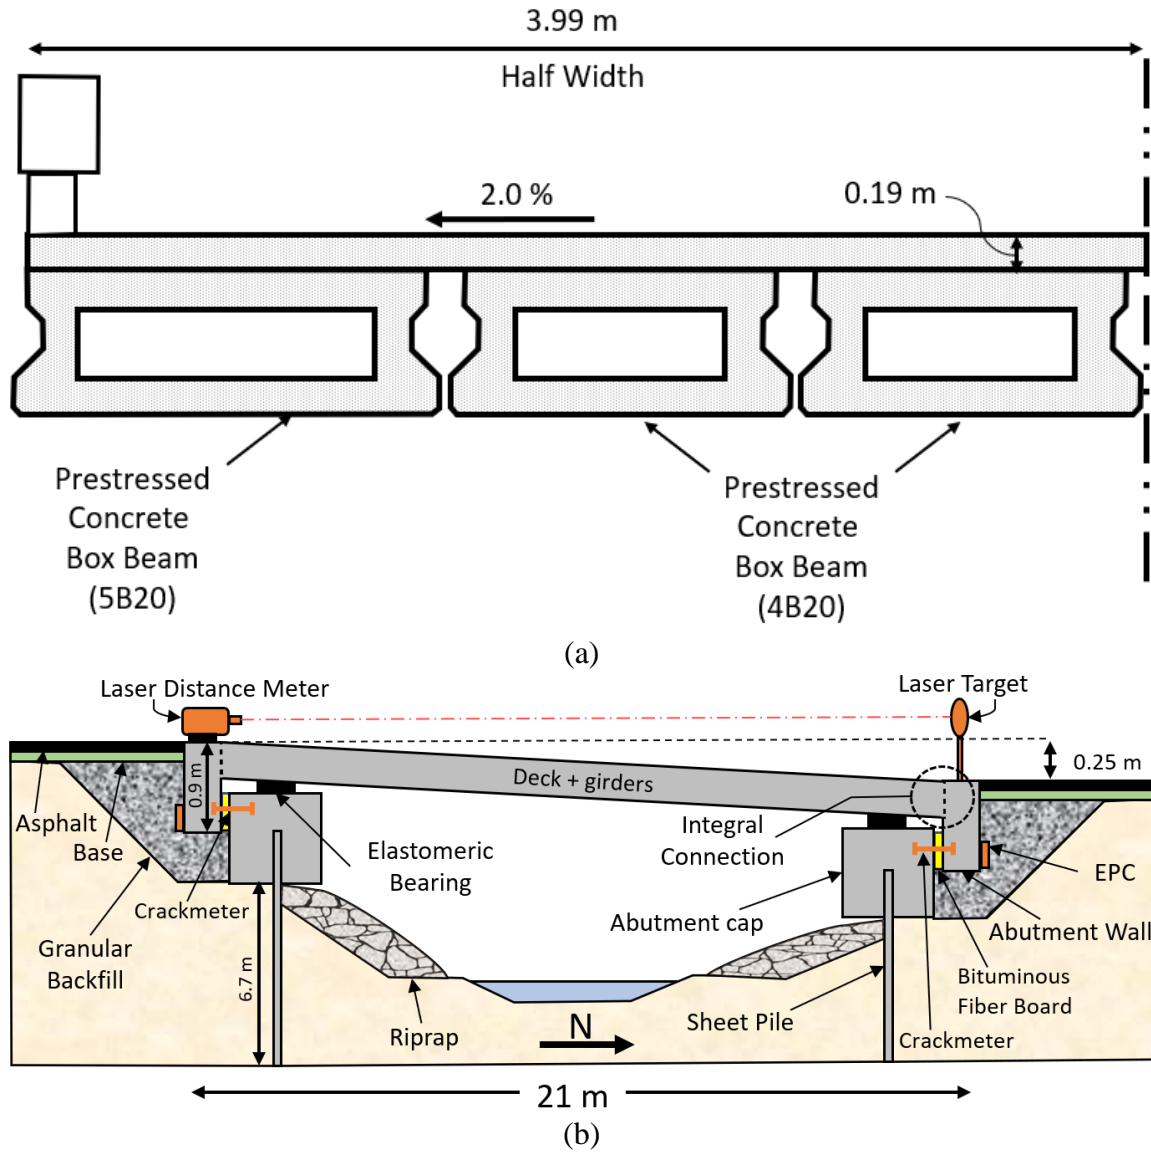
Schematic view of the Mack Creek semi-integral bridge: (a) Transverse cross-section (half width); and (b) Longitudinal cross-section with the location of sensors. (Note: EPC stands for earth pressure cell)
